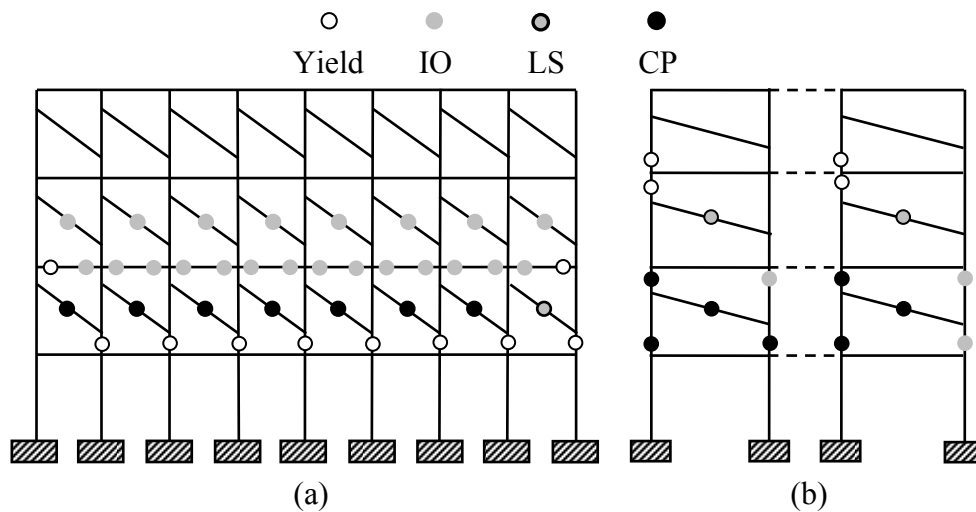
Collapse mechanism of four storey RC infilled frame buildings with open ground storey, designed as SMRF considering provisions of BIS (2002) for open ground storey: (a) typical longitudinal frame; (b) typical transverse frame.
